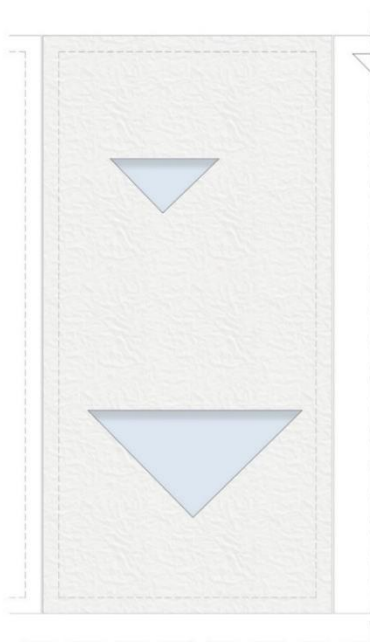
External wall layering & Polymer concrete panel – Scale 1-20
